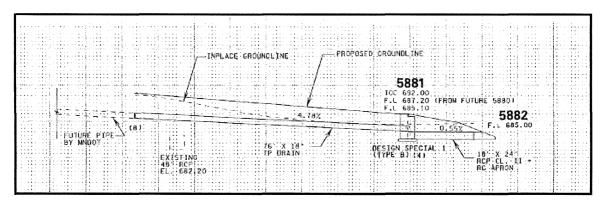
PRE-CONSTRUCTION PROFILE OF DRAIN AND STORM SEWER 5881 TO 5882
